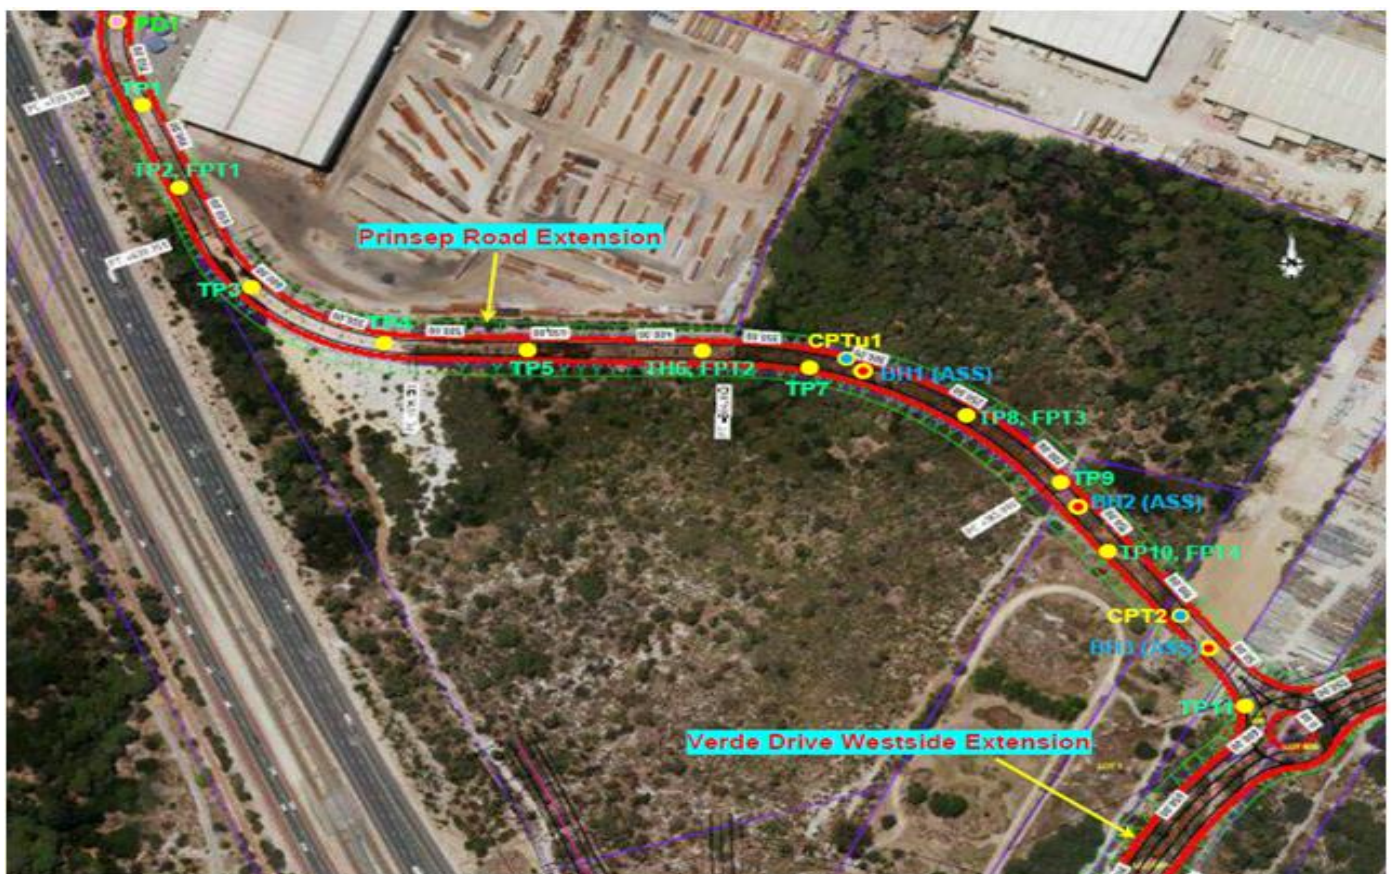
Geotechnical and Pavement Investigation for Prinsep Road extension
